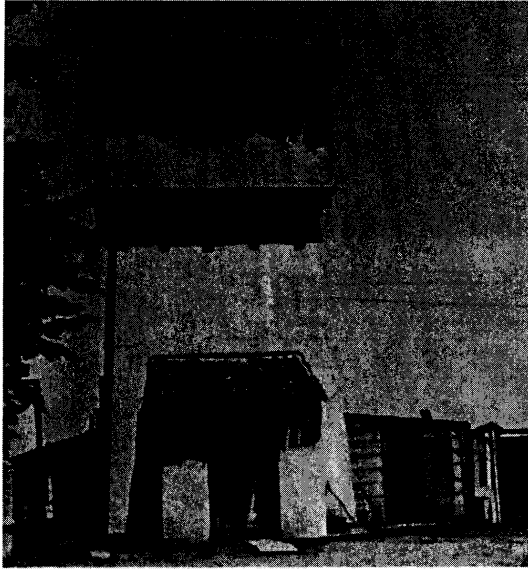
In a better state of repair than typical, this tapered tower box type with its gambrel roof matches a gambrel roof on a nearby barn near Waterford, Stanislaus County. The gambrel roof is not common in California.
